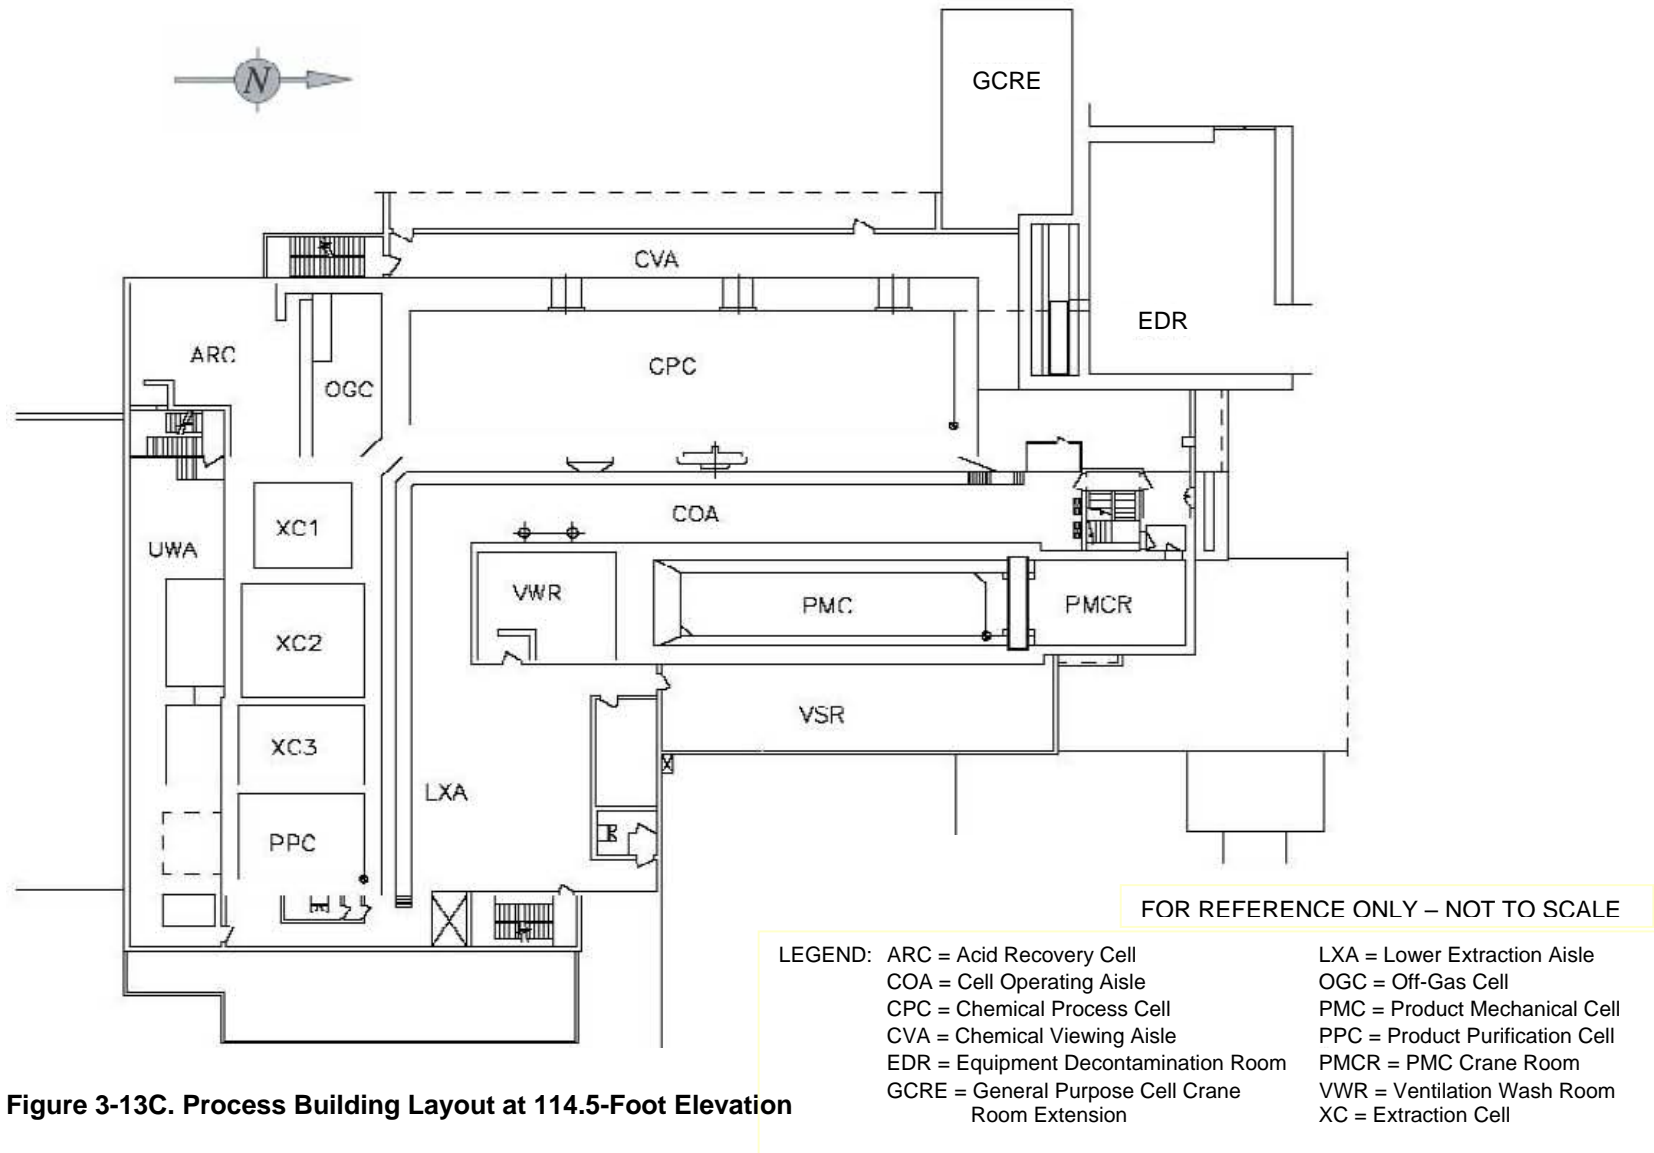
C. Process Building Layout at 114.5-Foot Elevation
